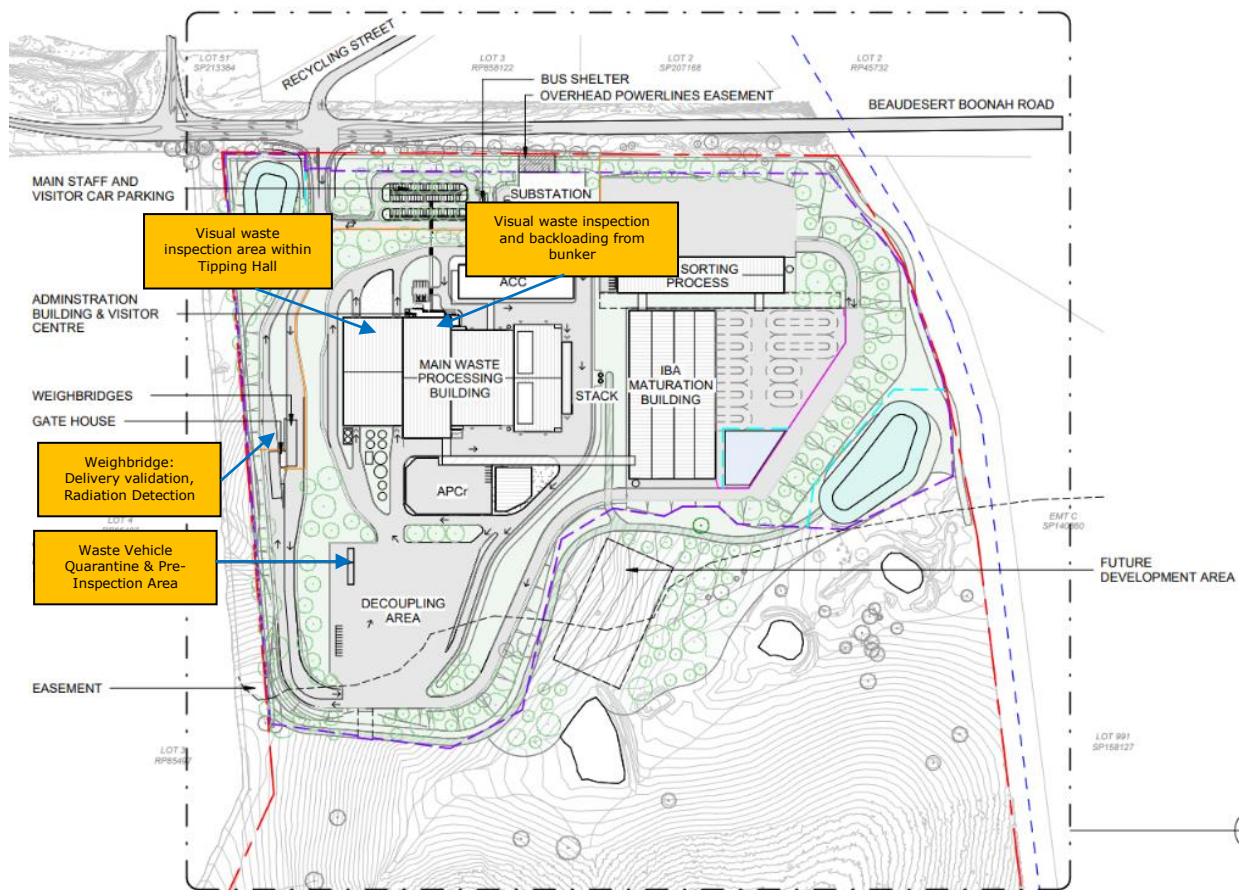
Site layout – feedstock QA/QC areas [Preliminary Subject to Detailed Design].
